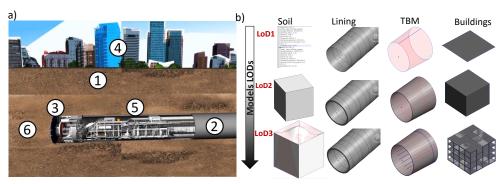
a) Main components of the urban tunnelling process: 1) soil, 2) lining, 3) TBM, 4) existing infrastructure, 5) grouting, 6) alignment; b) tunnel information model with components modeled on different LoDs: soil, lining, TBM and buildings
